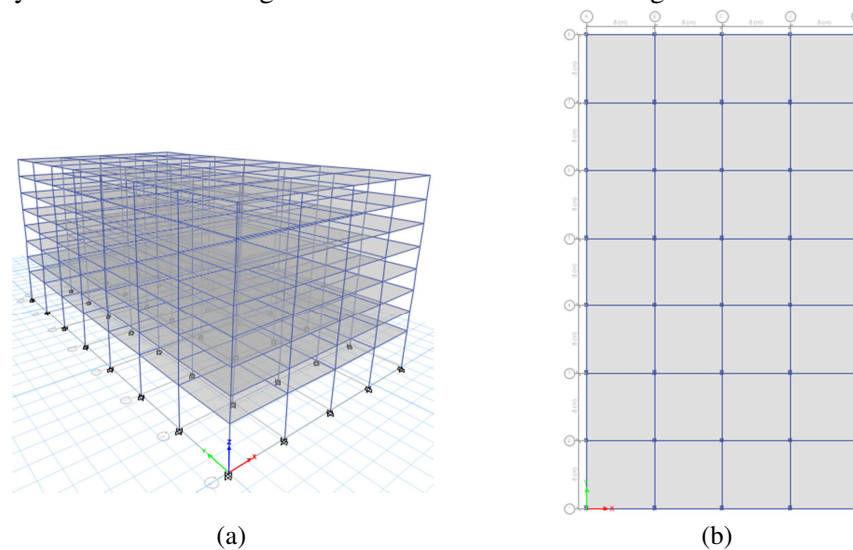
Engineering Model, (a) 3D view, (b) Plan view
